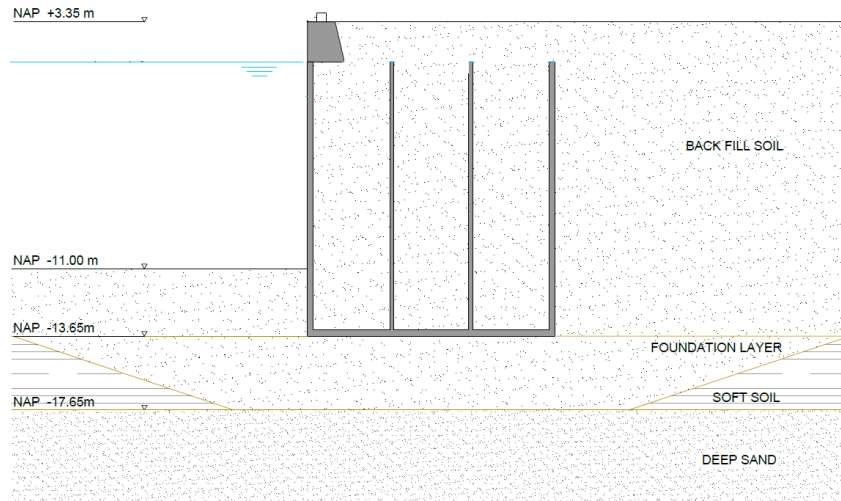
Caissons placed on a sloped foundation layer and different present soil layer
